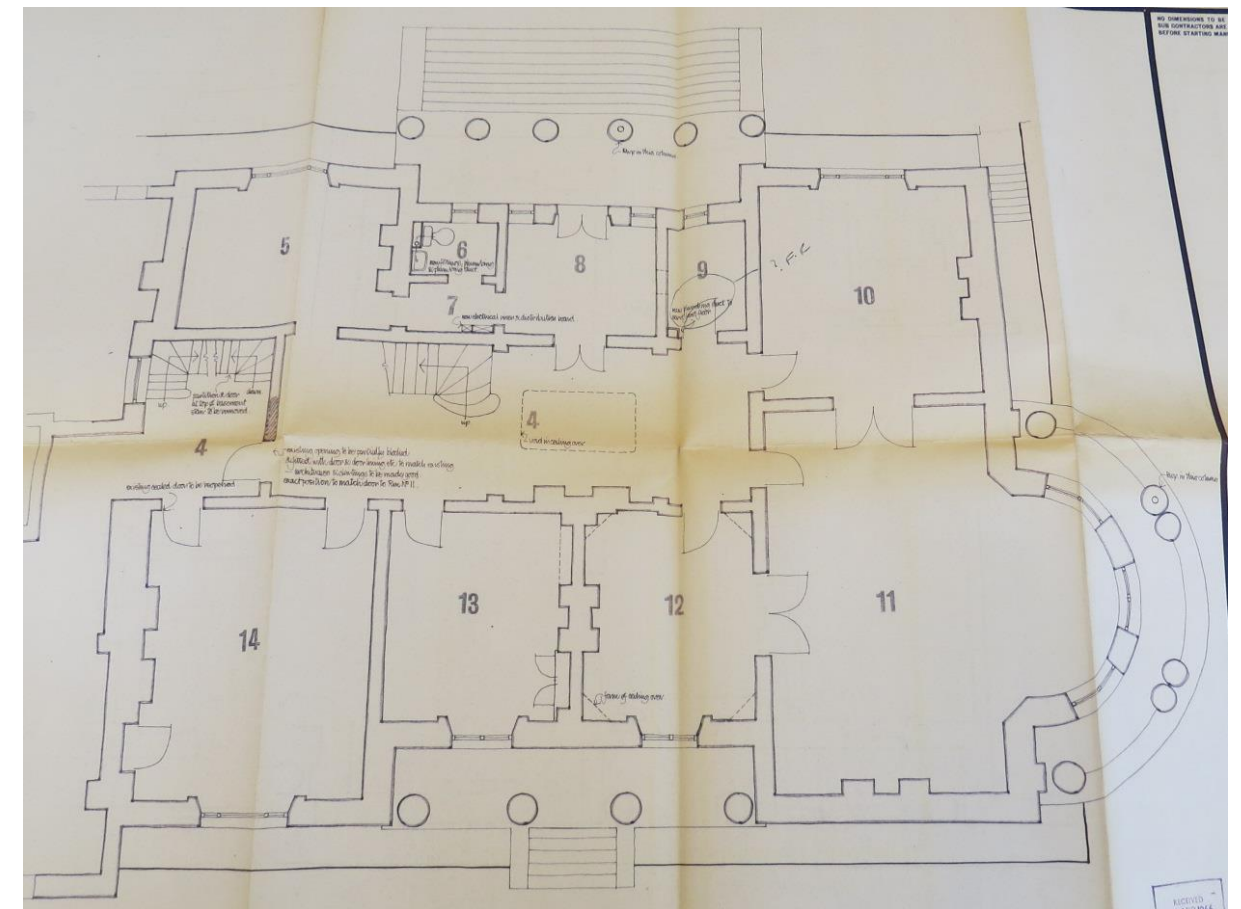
The Ground Floor general arrangement plan produced in 1966 by Casson Condor for the refurbishment works undertaken in the late 1960s.
